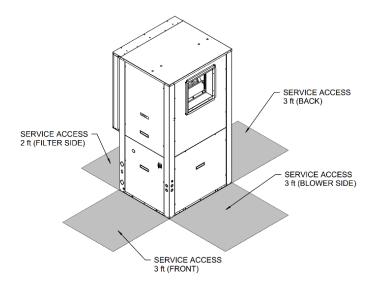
WSV6090 Side Discharge Clearance Requirements
